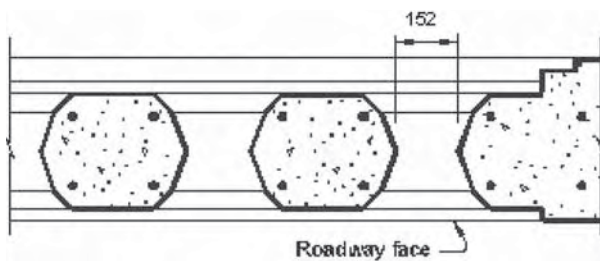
Plan view of Texas T411 bridge rail cross section (in millimeters).
